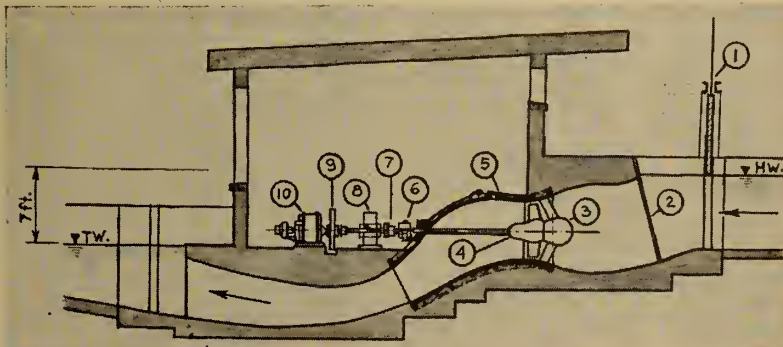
Typical Horizontal-Shaft Kaplan-type Turbine.
